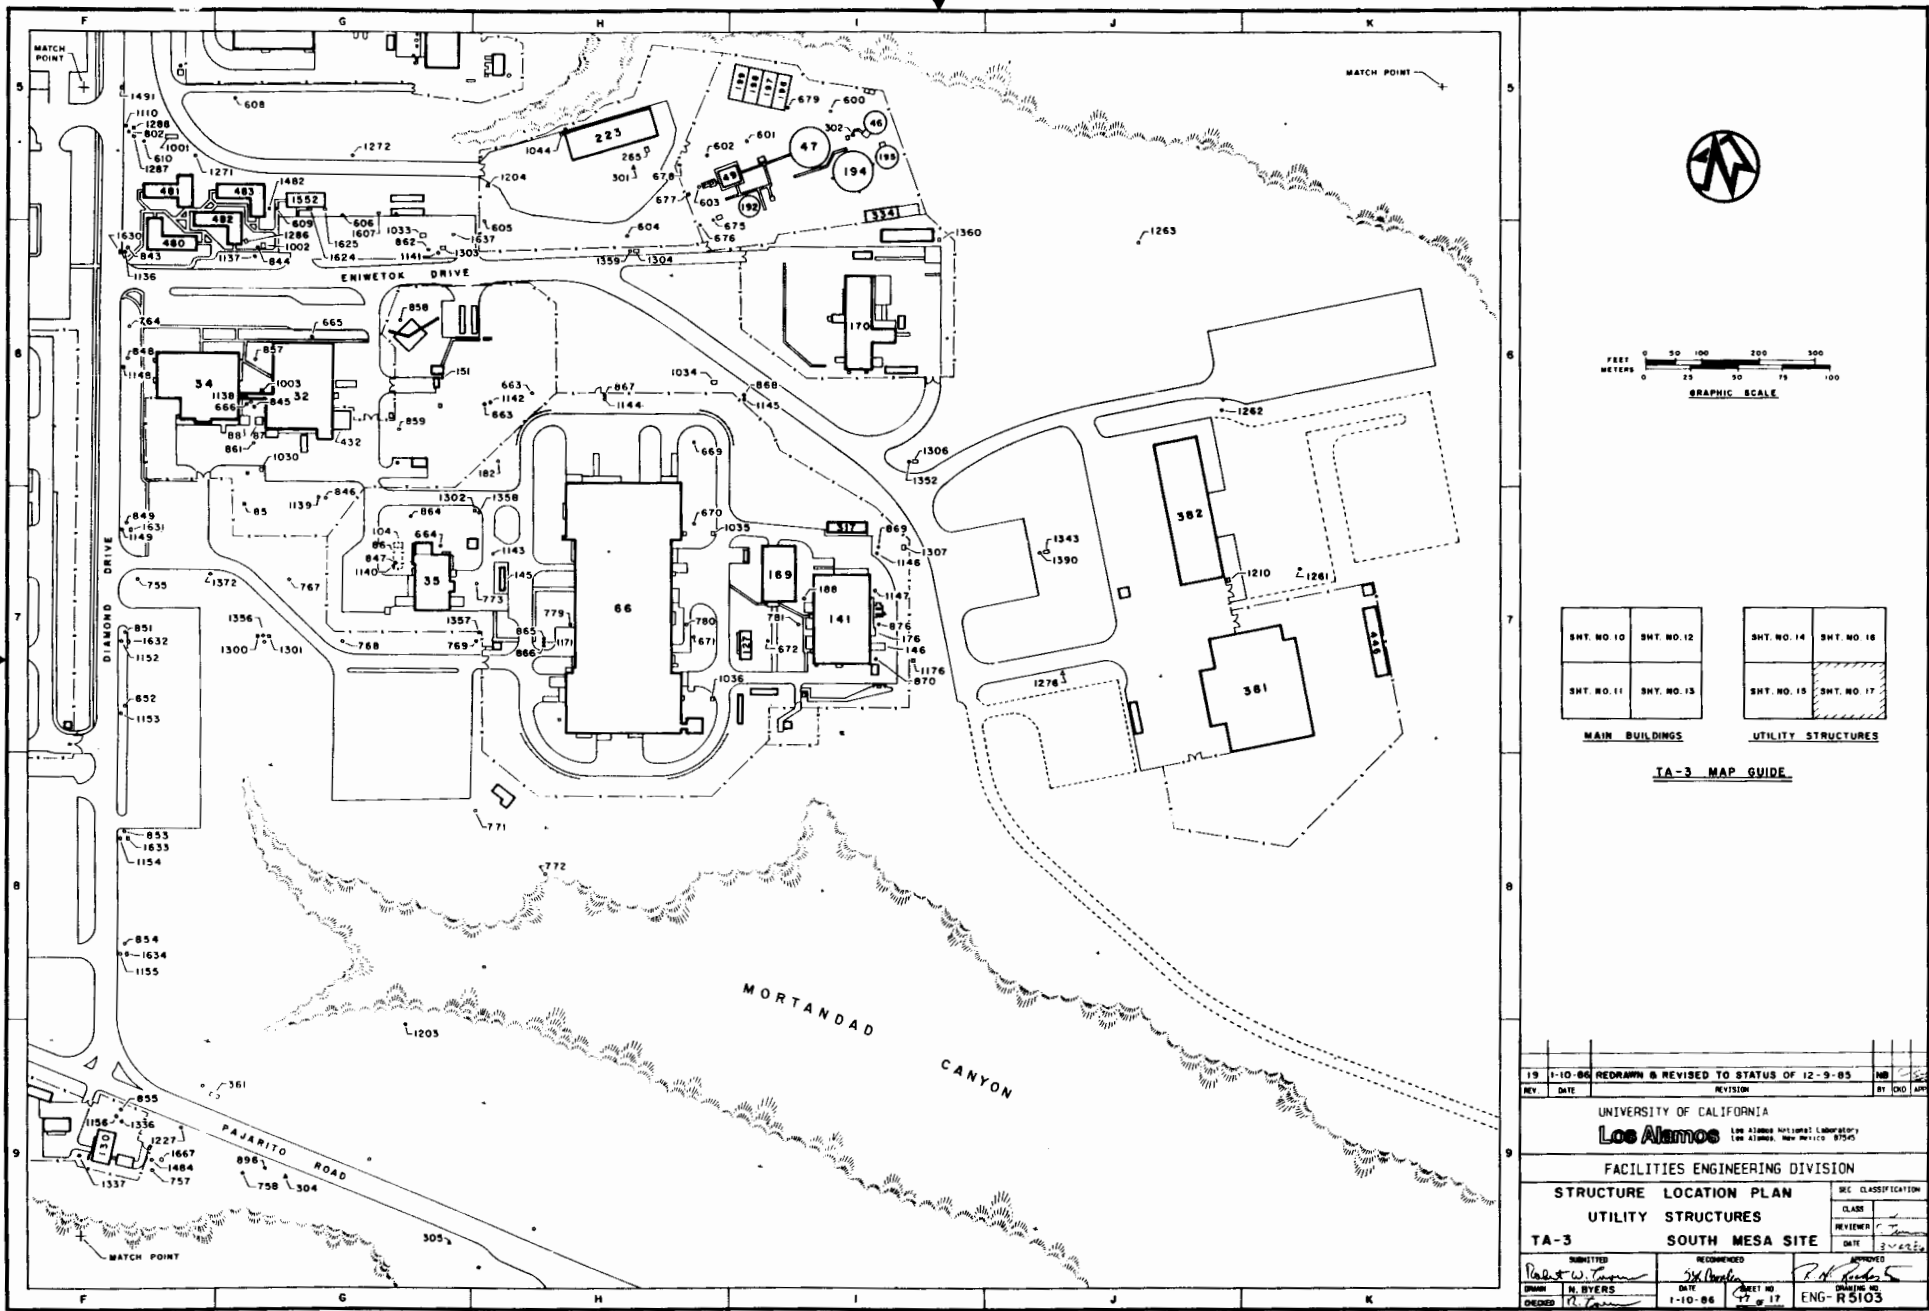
I: Structure Location Plan for TA-3 - South Mesa Site
